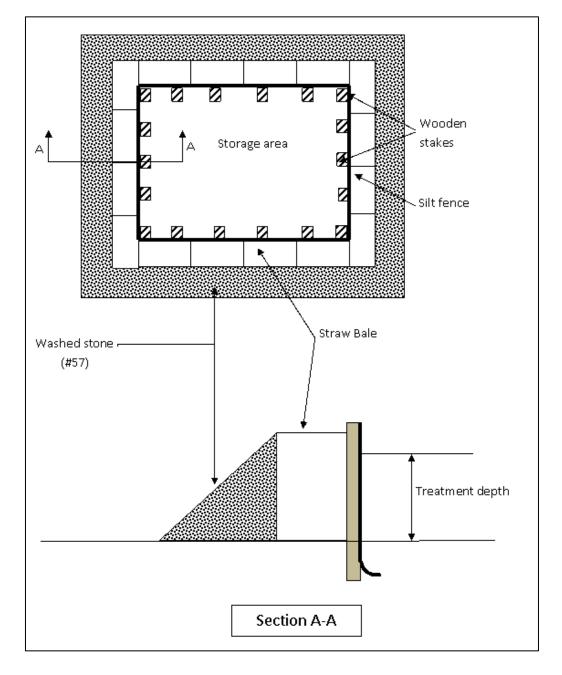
Typical Silt Fence and Straw Bale Pit
